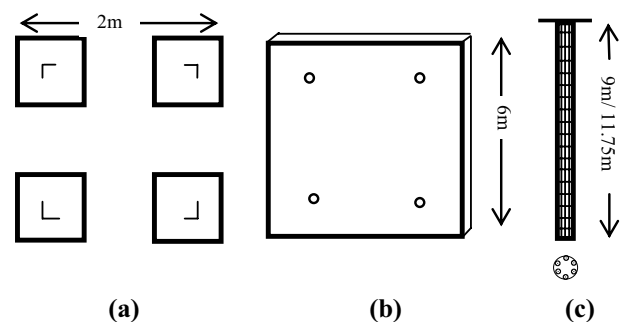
Foundation system considered (a) isolated footing, (b) mat footing, and (c) pile
